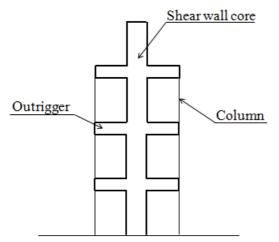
Core structure with outriggers connecting the façade to the centric located core.
